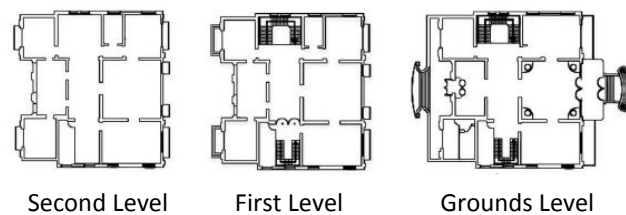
The Museum Floor Plan (Afifi, Amin, 2013,page 83)
